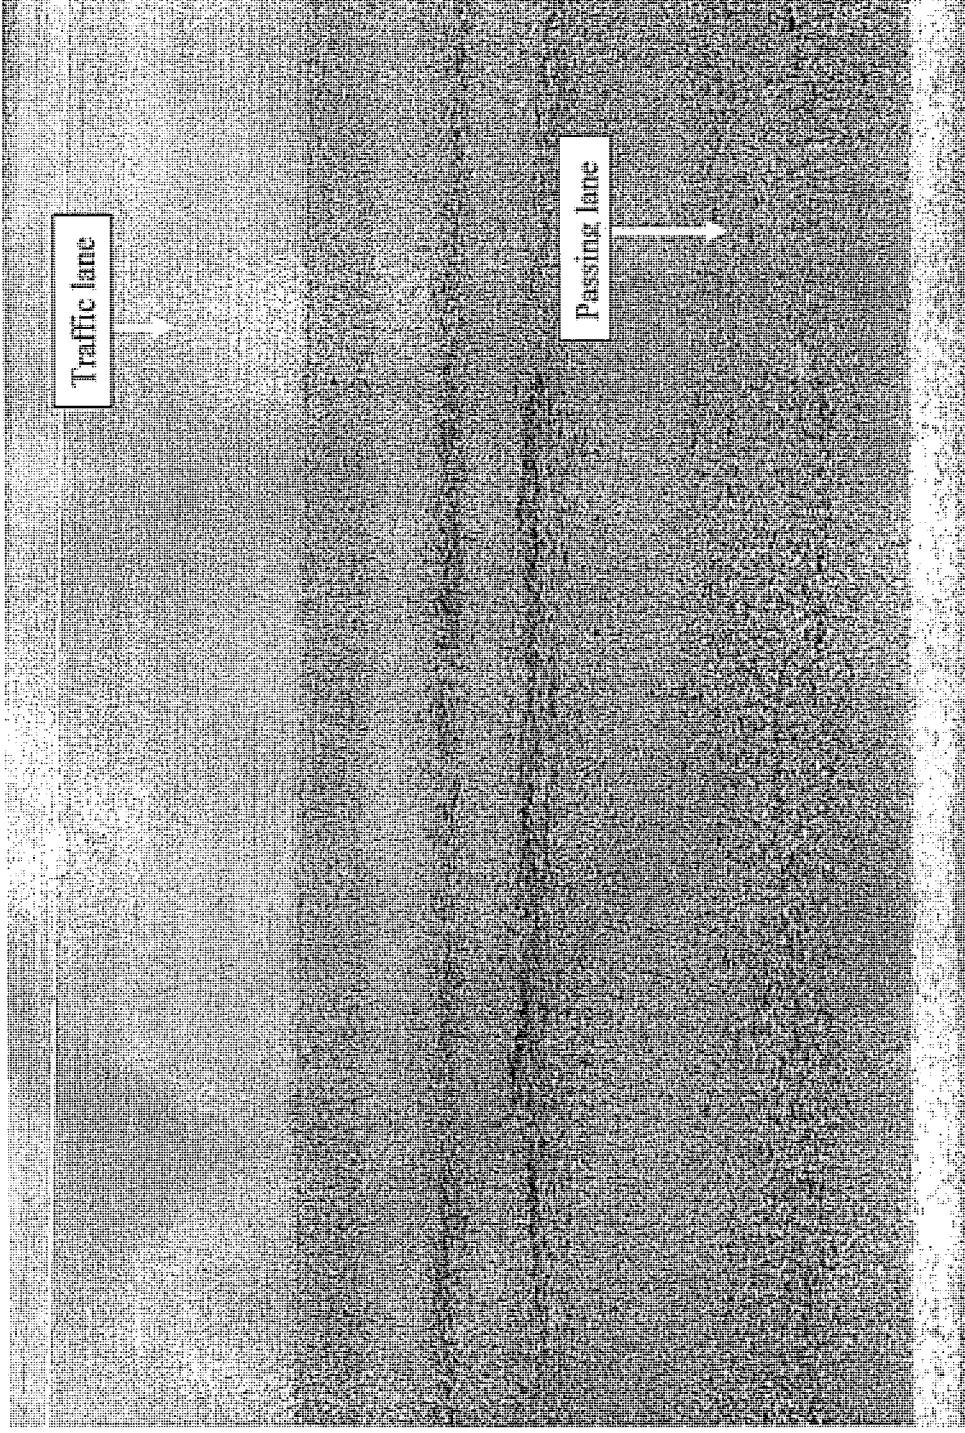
US-23 SB Control Section 47013, 47014 Job Number 29768 BMP 5.5, EMP 7.0; the relative pavement condition in segregated area (passing lane) and in a non-segregated area (traffic lane) 2-years after construction.
